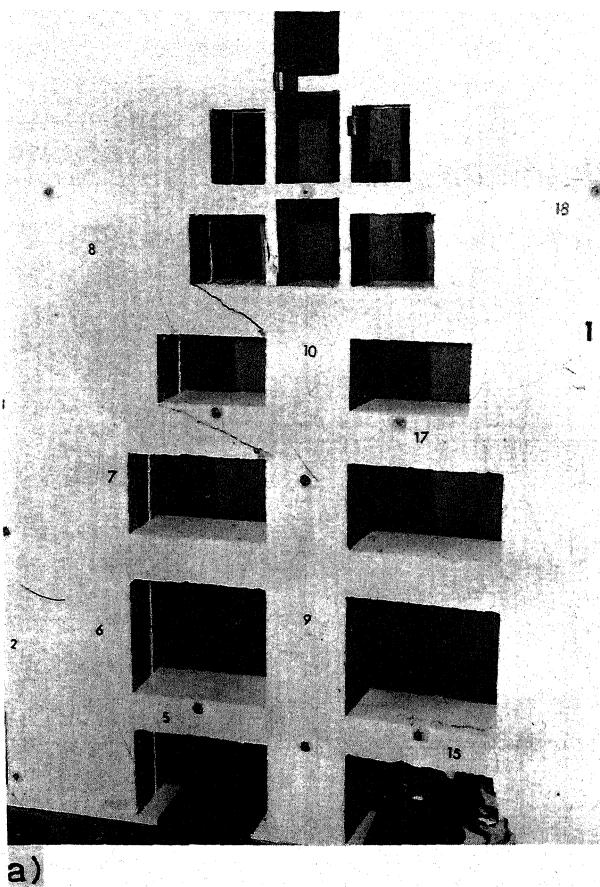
Test of reinforced concrete Model 2 (shear walls with openings).
